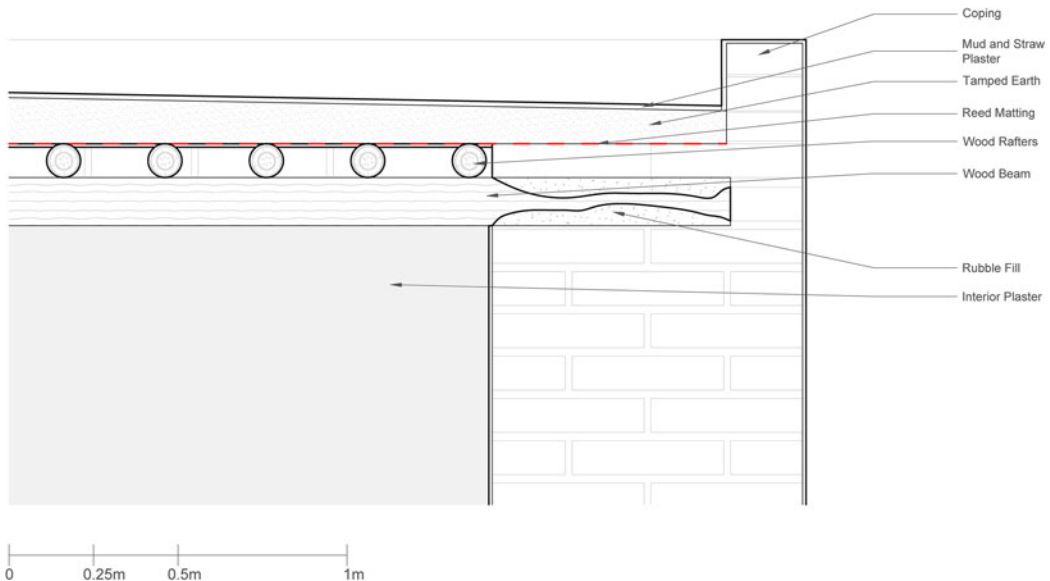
Section detail, showing the construction of the roof of the Christian Building (M8-A). (C. Leon Angelo and J. Silver.)
